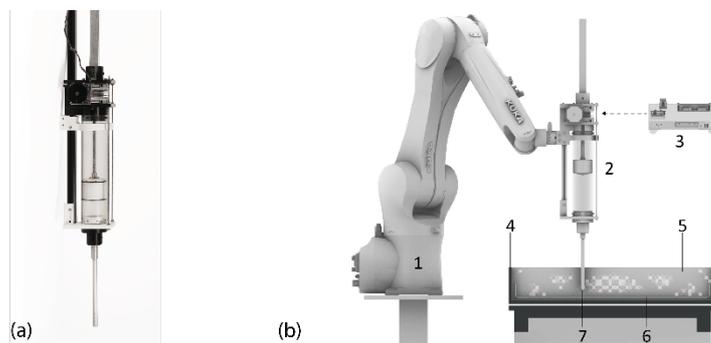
(a) Custom made plunger paste extruder. (b) IGP fabrication setting. 1 KR10R1100. 2 Paste extruder. 3 Extrusion controller. 4 Formwork. 5 Poured concrete. 6 Reinforcement. 7 Injected gypsum-based support.
